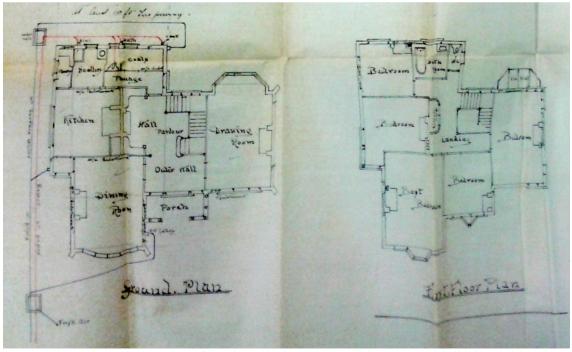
No. 2 Monkhams Avenue floor plans. The house is accessed via a central hall with the other rooms loosely arranged around it (Ibid.).
